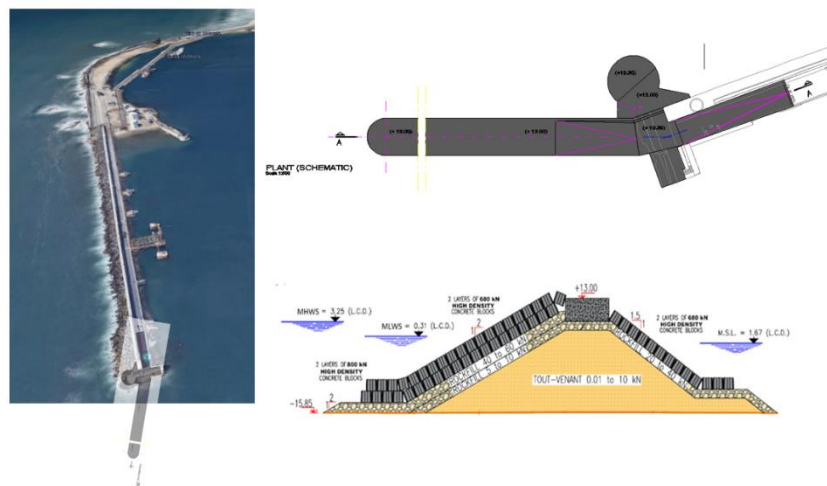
Proposed Wave Harvesting extension to Breakwater at Leixões
